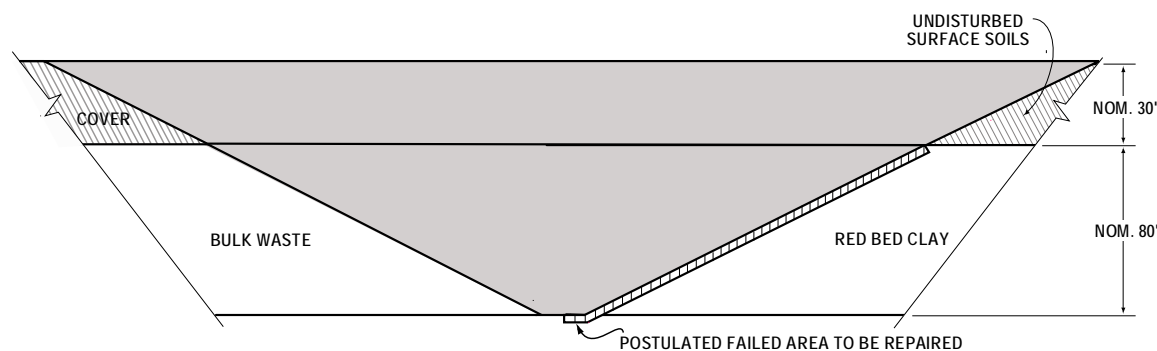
Depiction of Excavation Required to Repair Postulated Failed Area on Side Slope of FWF-NCDU
